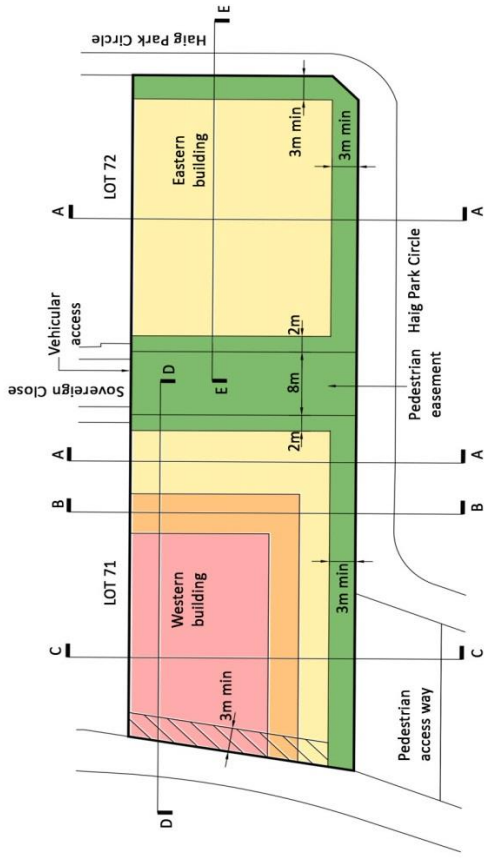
Lot 70 - Building setbacks and building envelope cross section locations.
